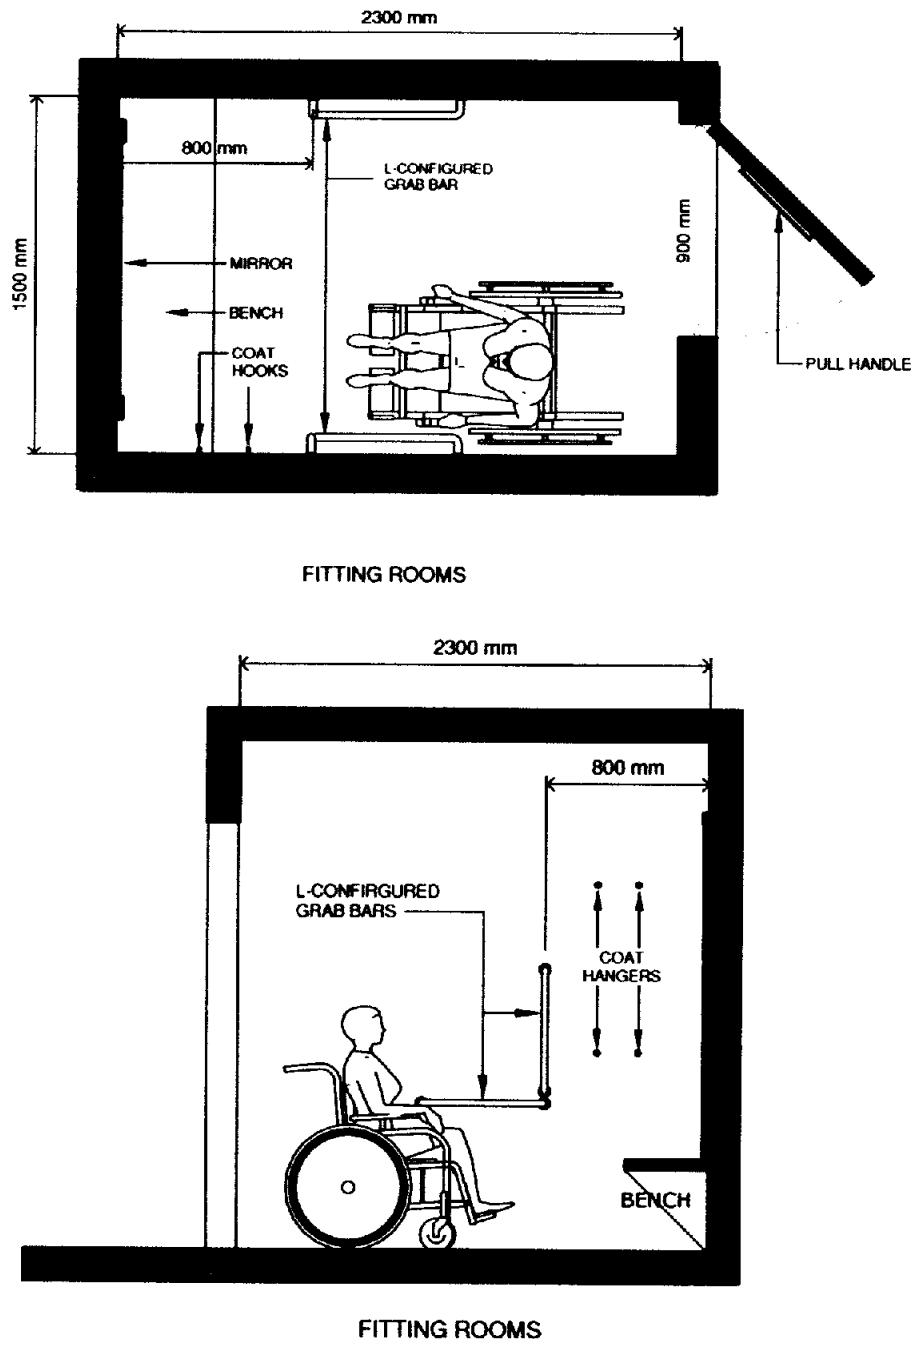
Illustration of the minimum design specification of an accessible changing room.
